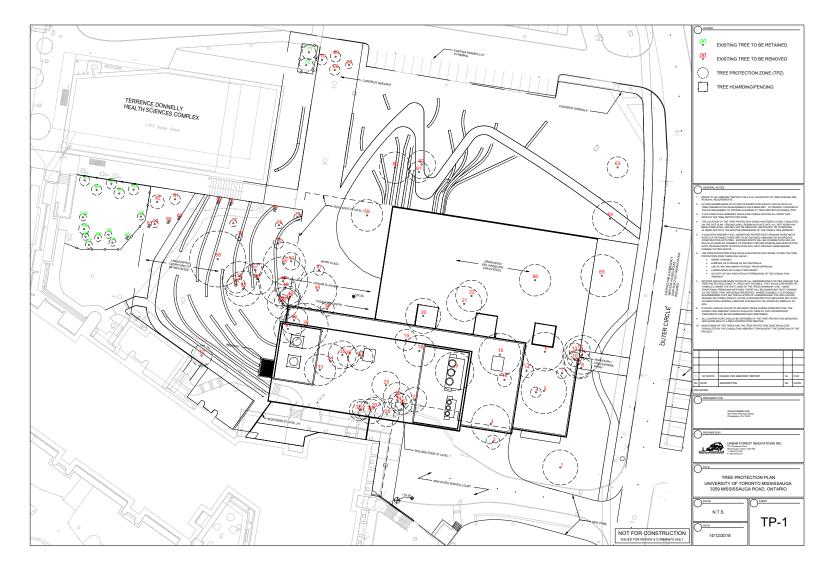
Tree protection fencing to be established around young trees at west side of subject site.
